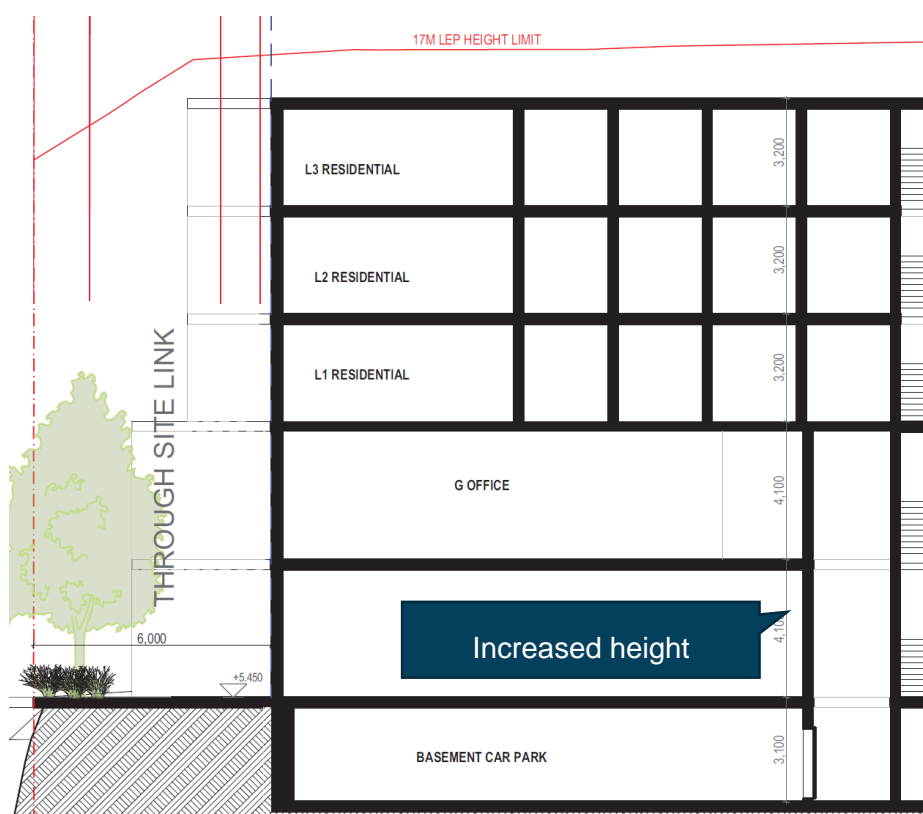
Concept section (source: Urban Design Report) – Note the greater heights of the lower floors identified for office use
